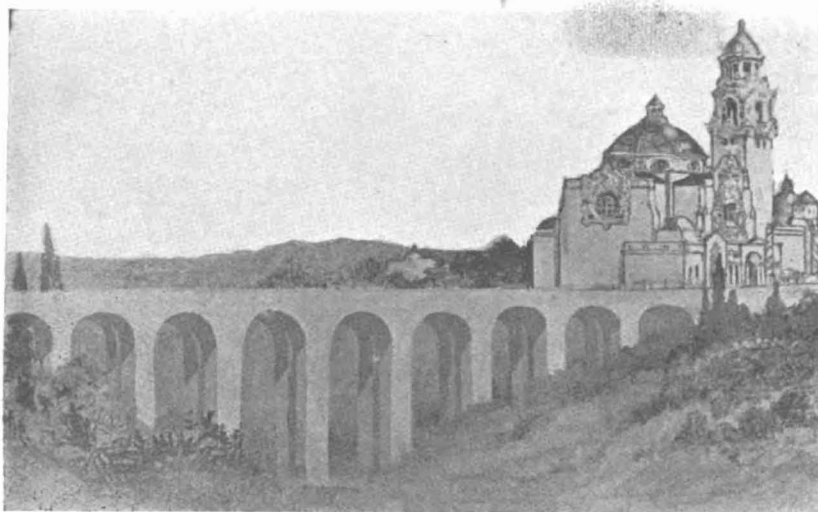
ARCHITECT'S PERSPECTIVE OF THE COMPLETED BRIDGE
